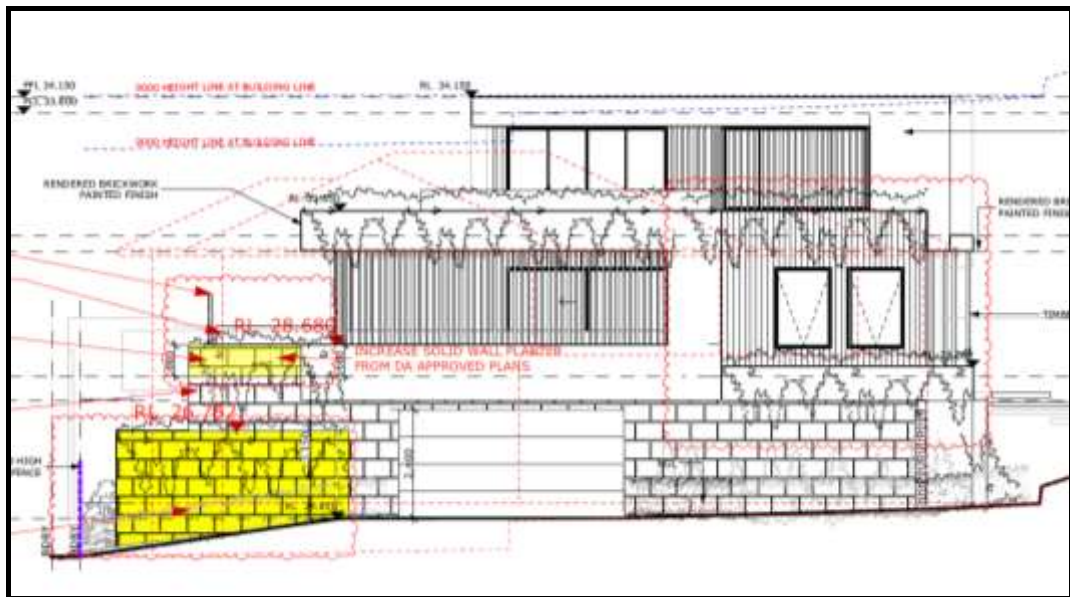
View of Proposed retaining walls from Boronia Street frontage (Source: Source: Issue L - David DeChiara, 24/5/2022)
